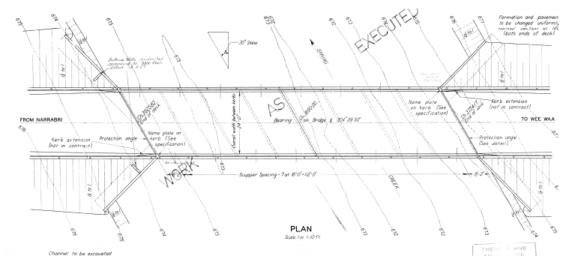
Plan of Spring Creek Culvert (Source: WAE drawings)
